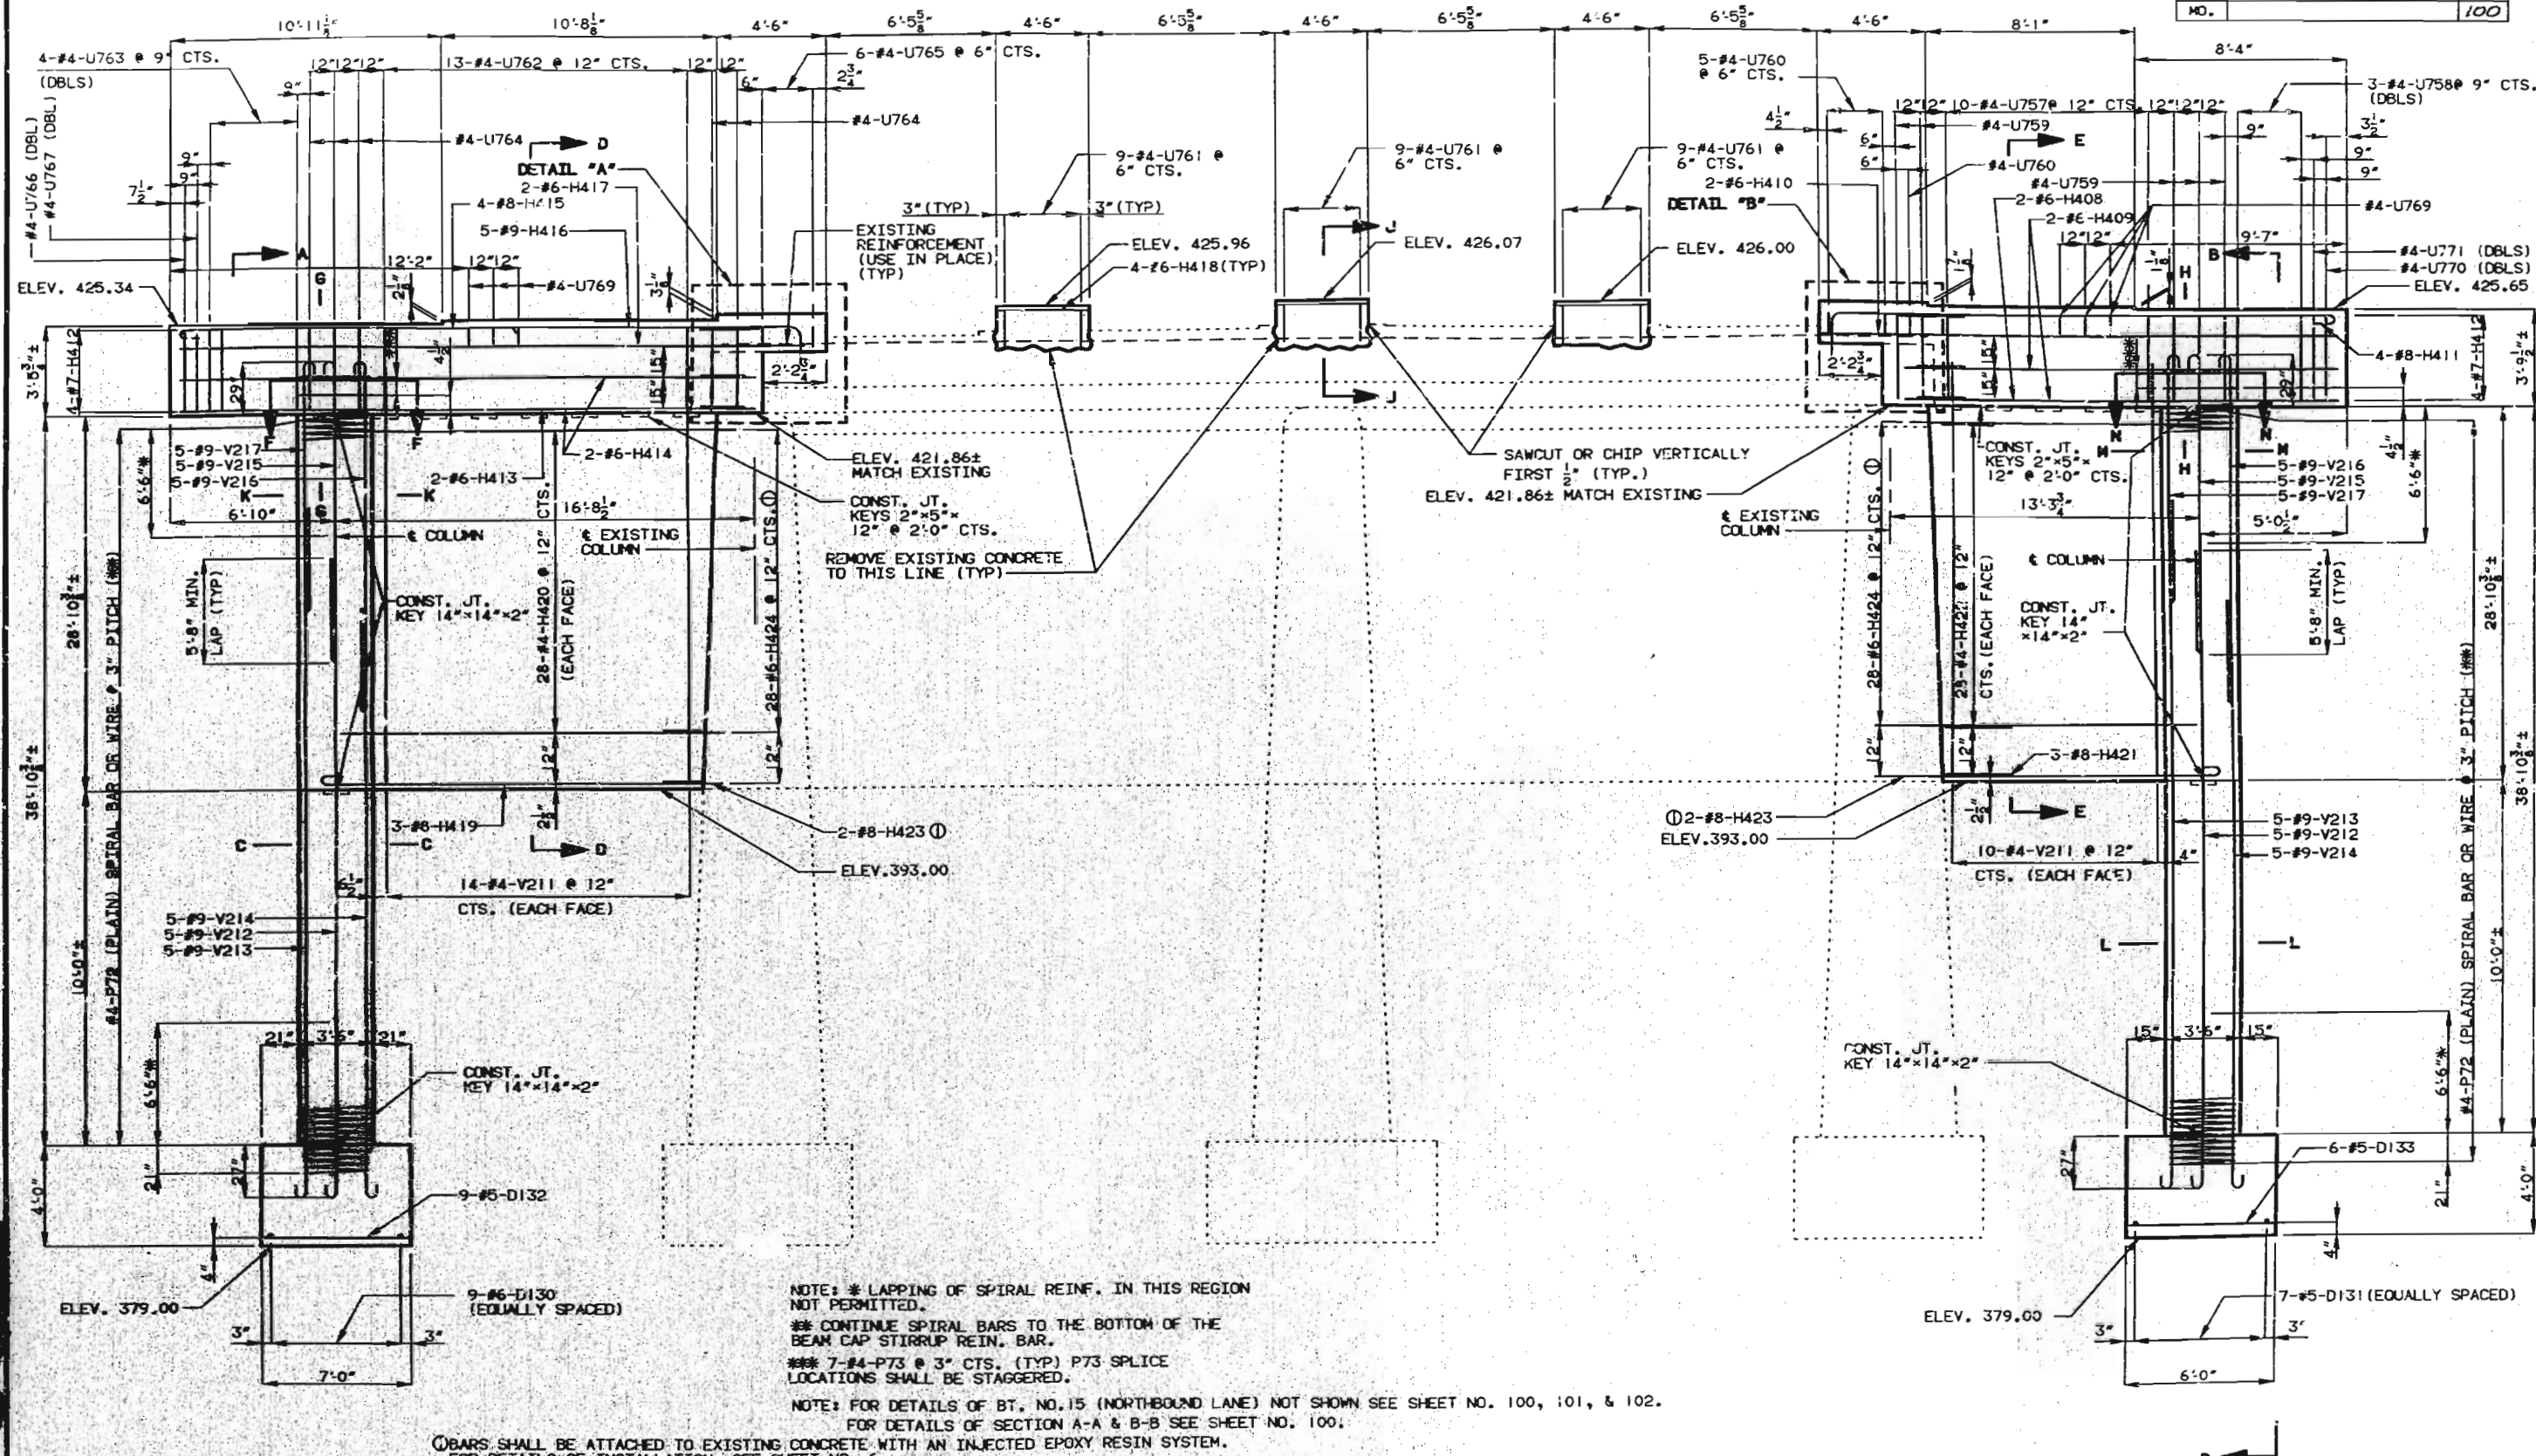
DETAILS OF INT. BENT NO. 14 (SOUTHBOUND LANE)
